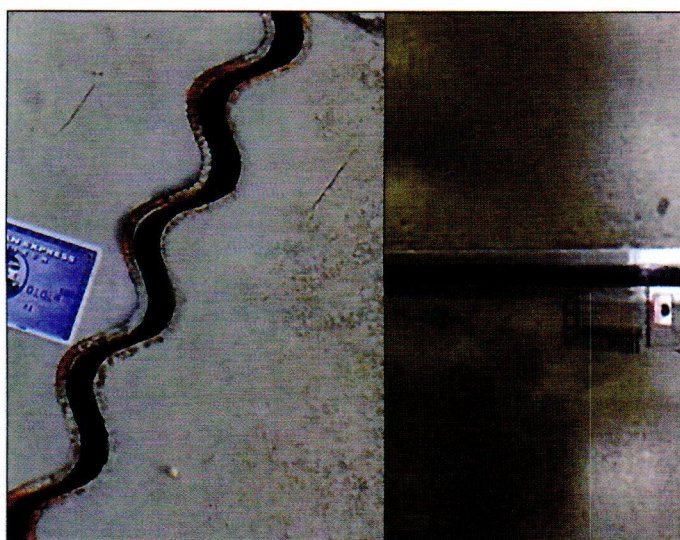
Typical 10 mm to 15 mm opening of armoured joints of steel fibre reinforced concrete joint-free floors compliant with The Concrete Society Technical Report N° 34
